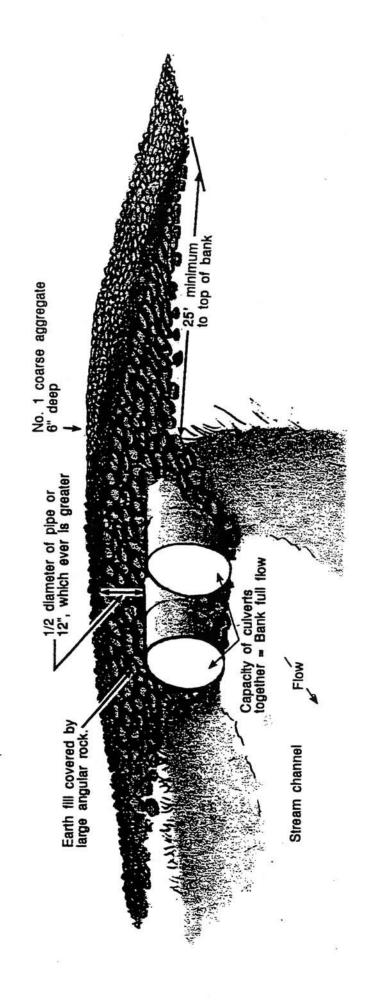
Details of a temporary structural (round pipes) stream crossing.
